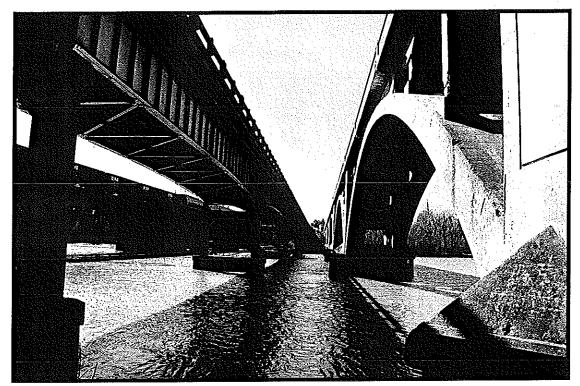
Looking southeast at upstream elevation of US 29/70 Bridge No. 2; Wilcox Bridge to right and North Carolina Railroad bridges to far left.
